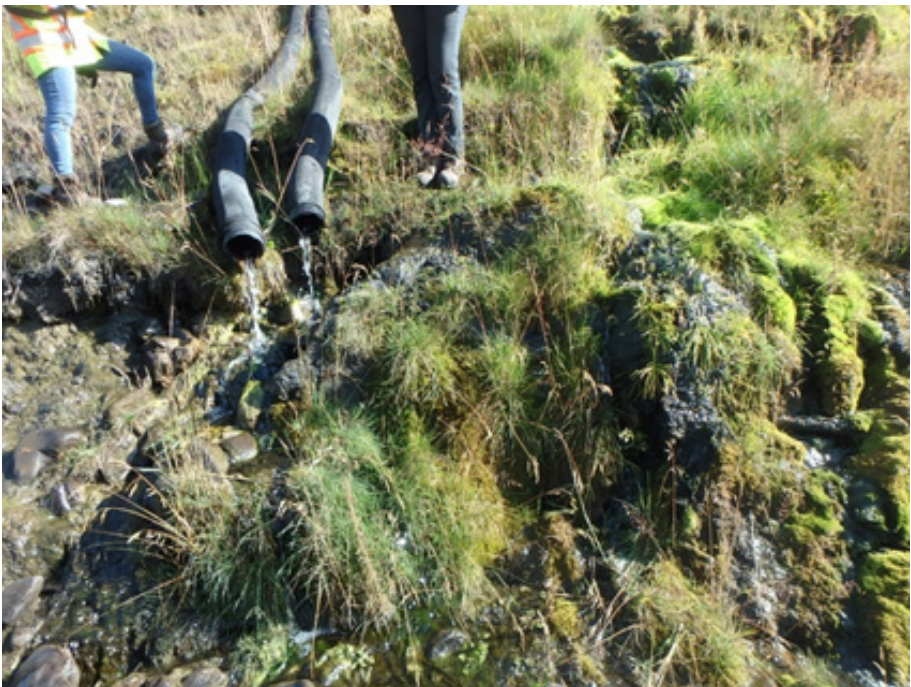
STP West Dam Downstream Slope, on Access Road near Station 0+550, looking Southeast toward Pipeline Ridge for old Dredge Pipelines to 2P-3P TSA, 10 September 2019
